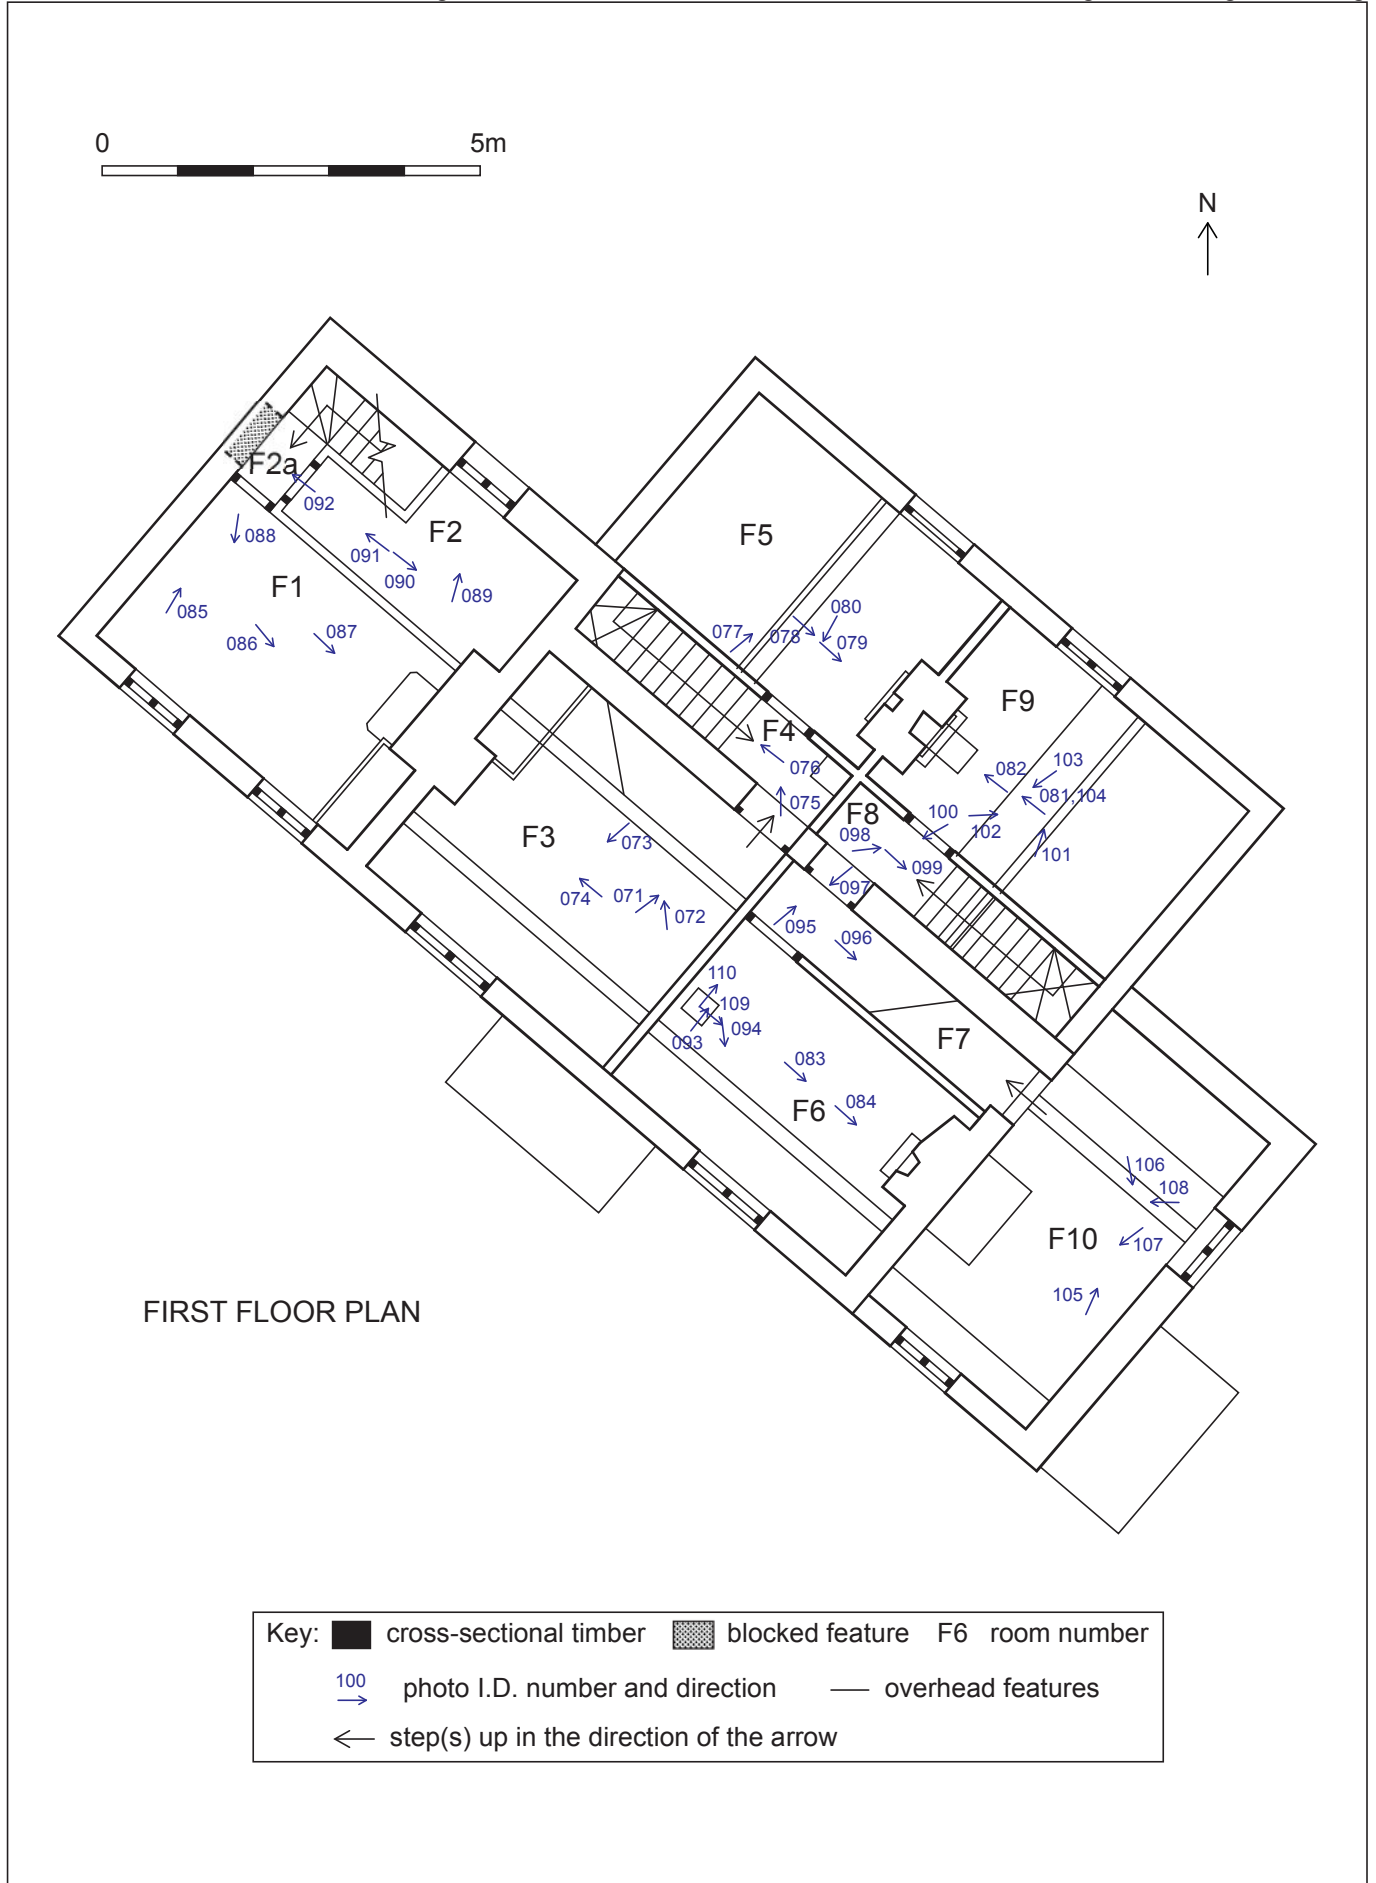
First floor plan, showing the location and direction of photographs taken on site
